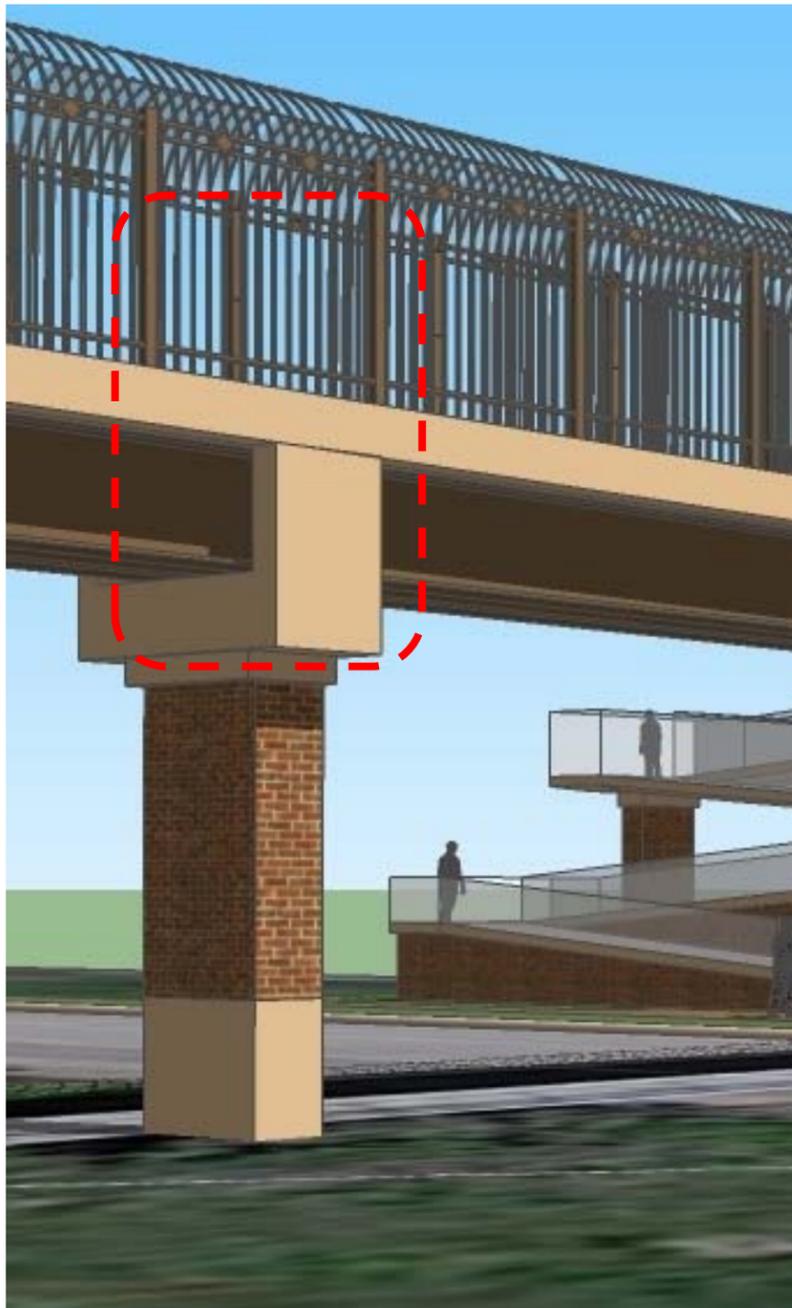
Pedestrian Bridge Column – Partial Elevation View
